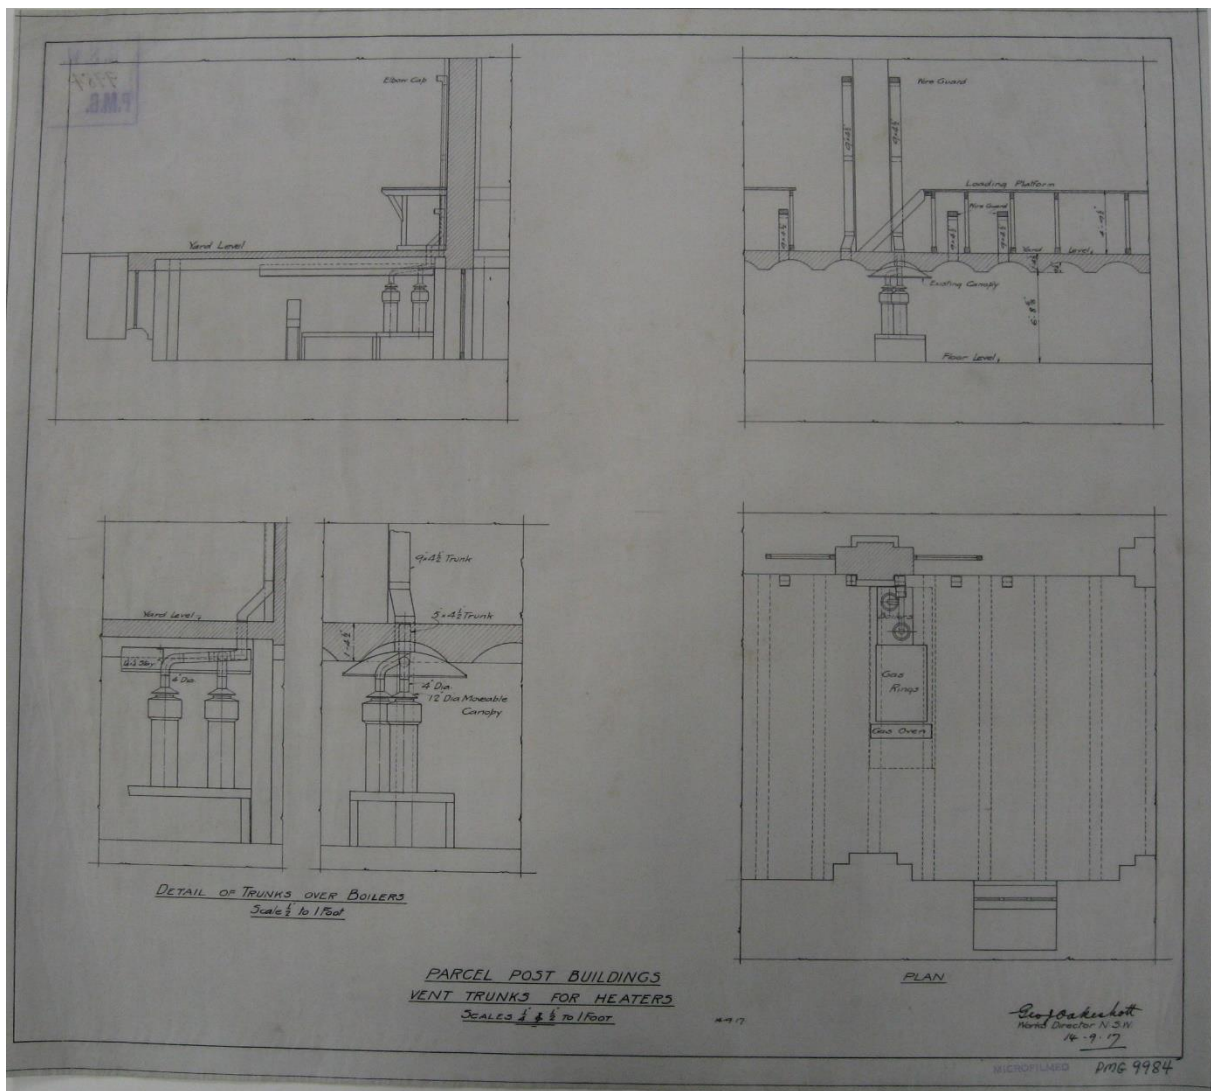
Parcels Post buildings, vent trunks for heaters, 1917
